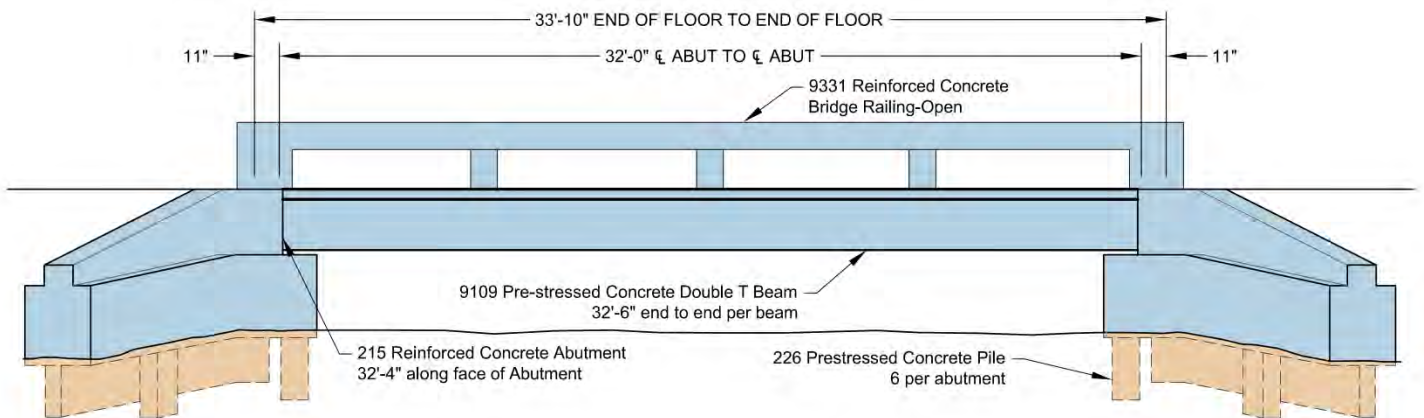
EI.24.6- 1: Elevation view of prestressed concrete double T Beam bridge
